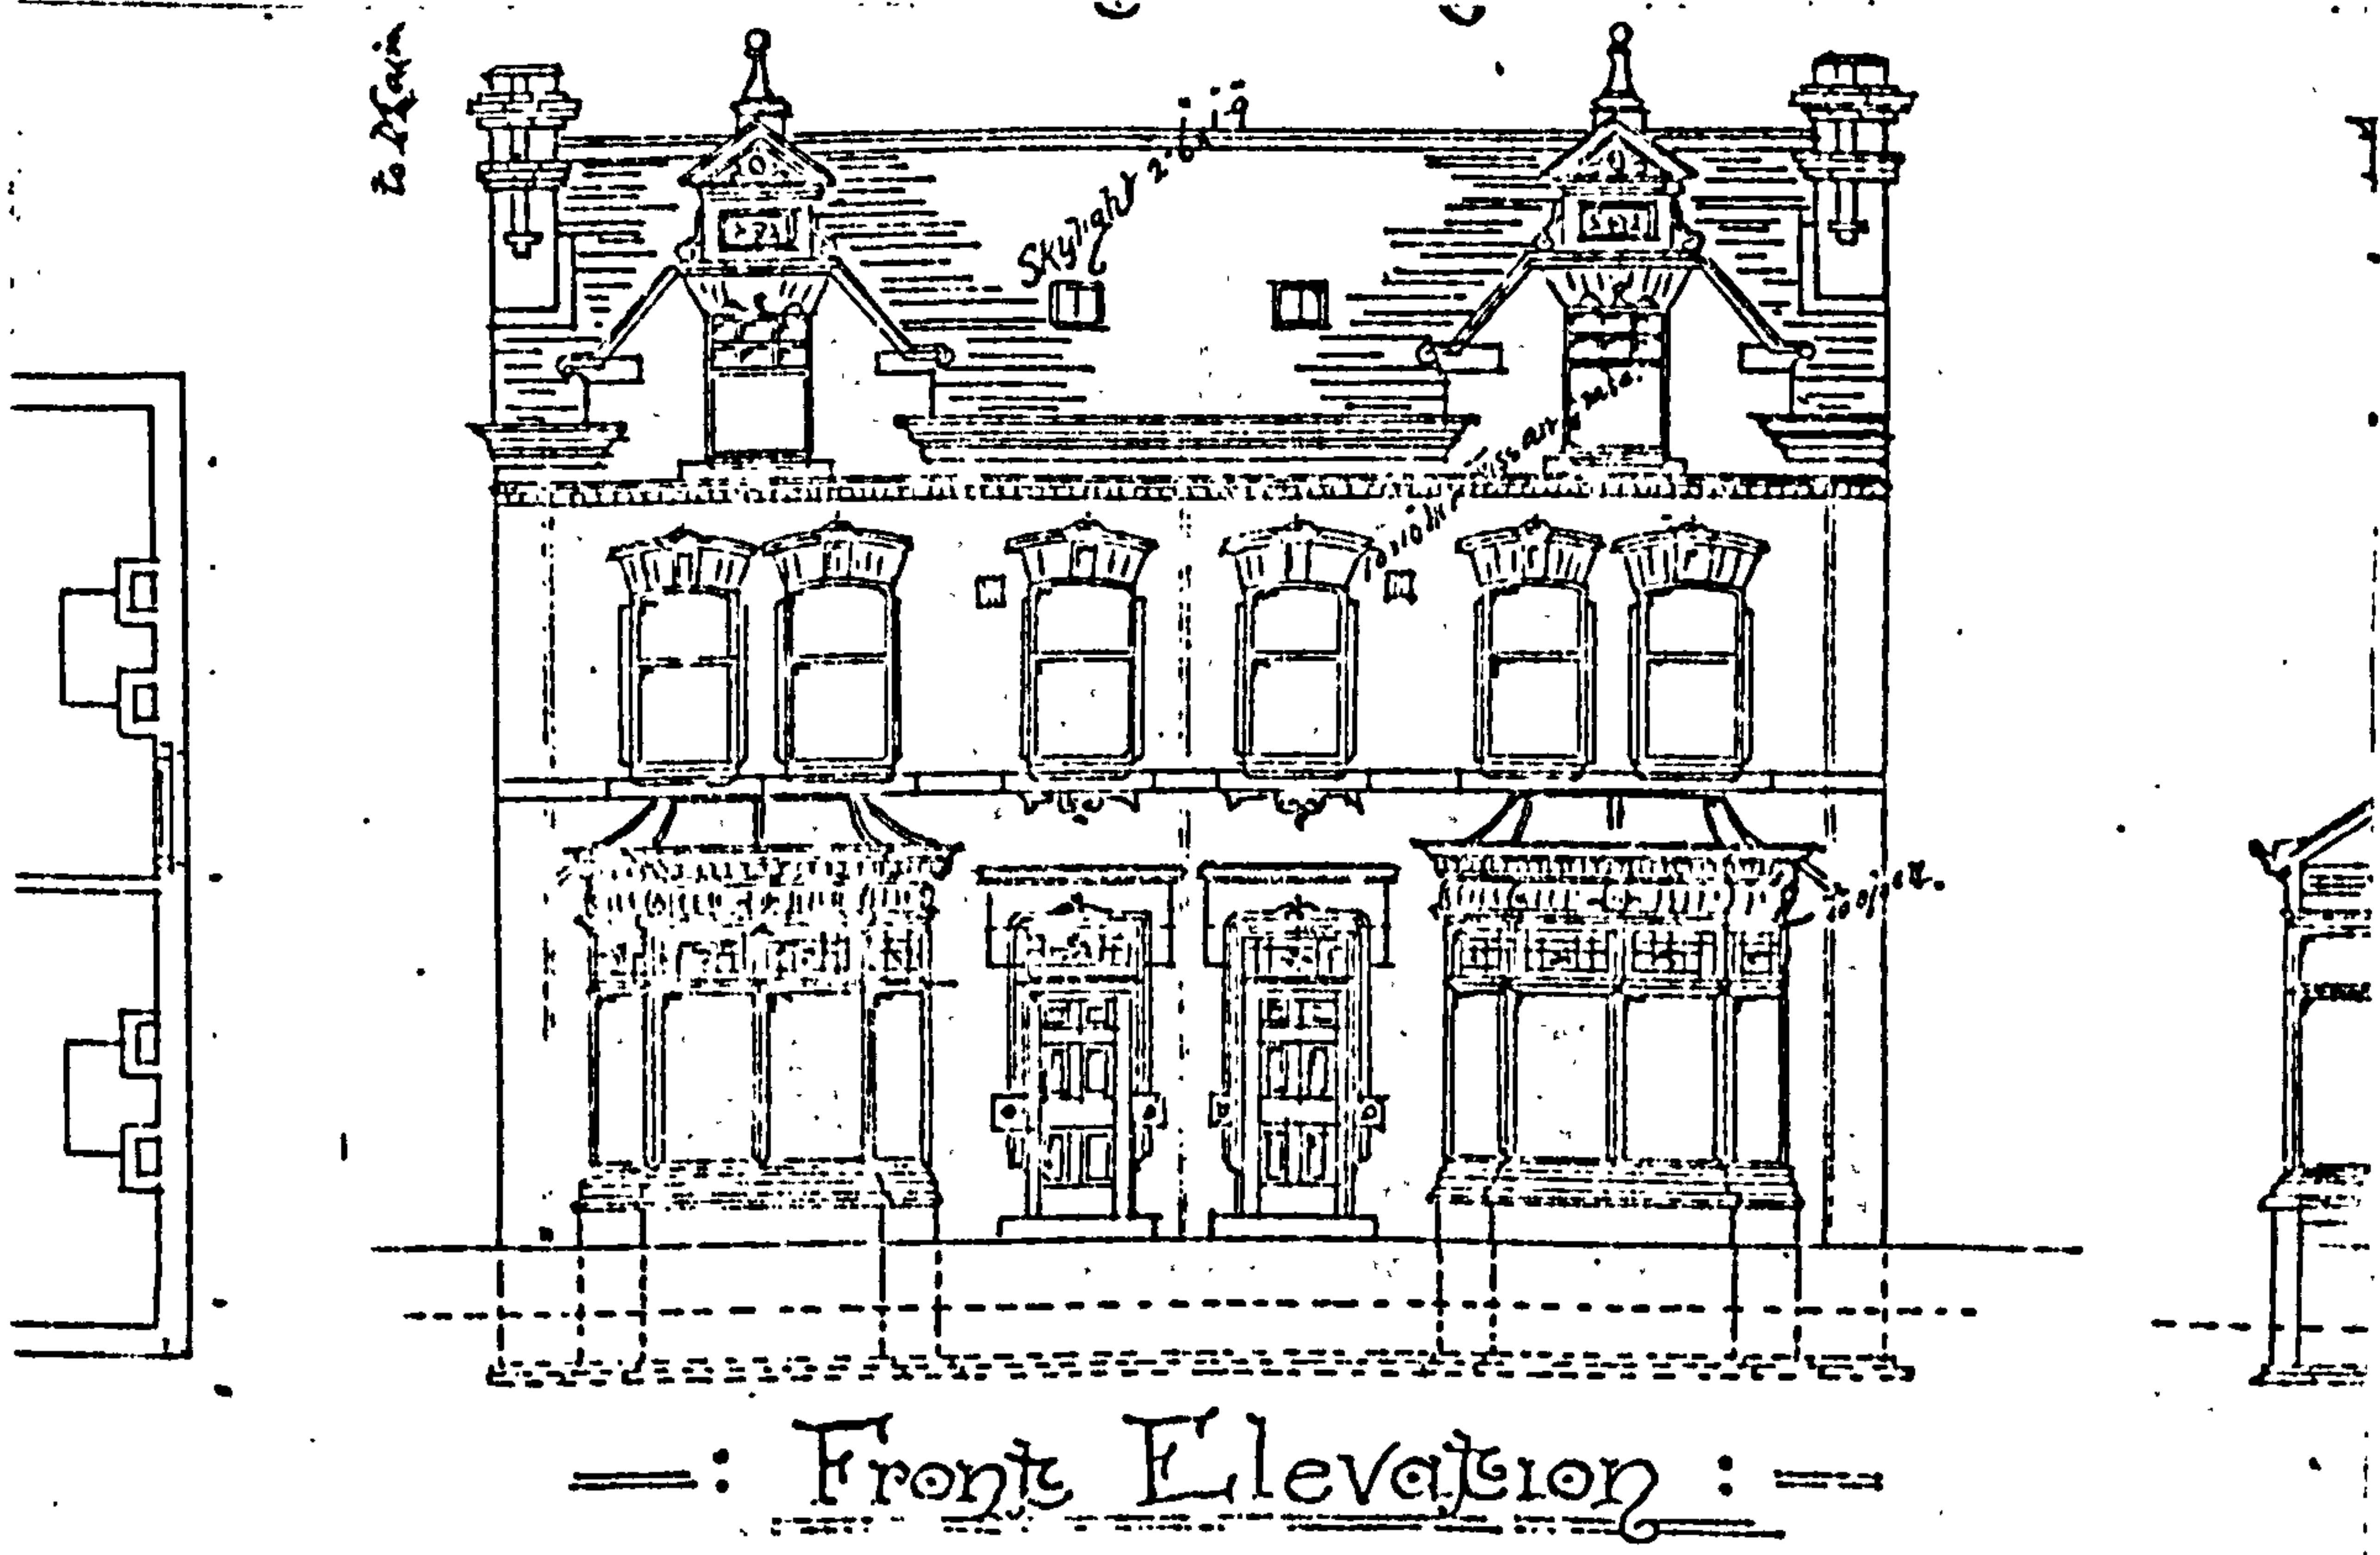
Deposited elevation of two semi-detached houses, Cardigan Road (Ambler & Bowman 1892).
